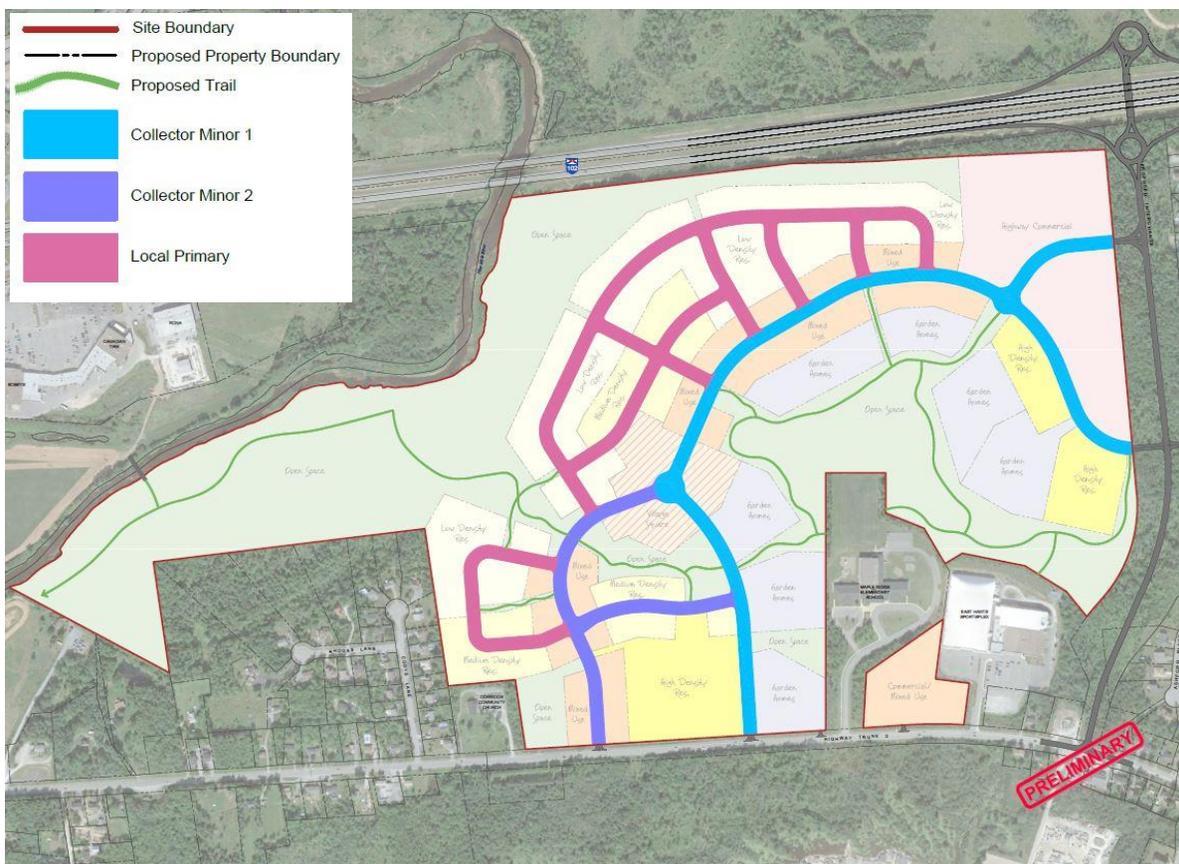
Proposed street network plan for the Lantz Lands. See Appendix A for larger plan image.
